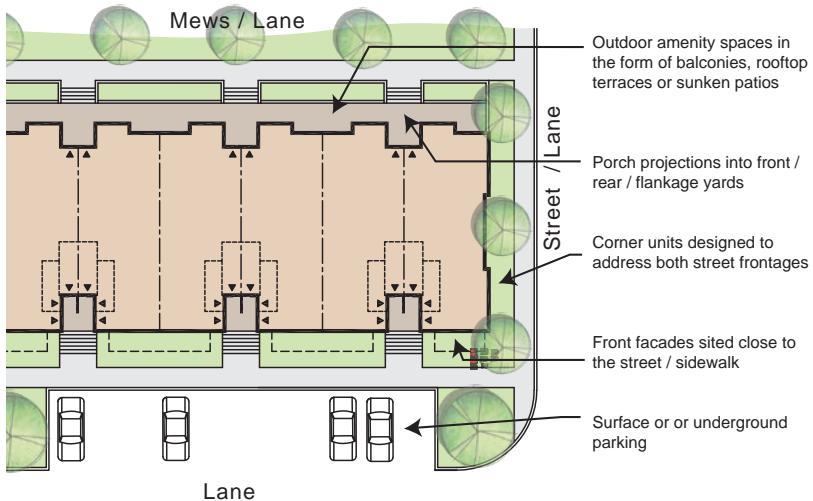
Conceptual plan layout for stacked townhouses with underground parking
